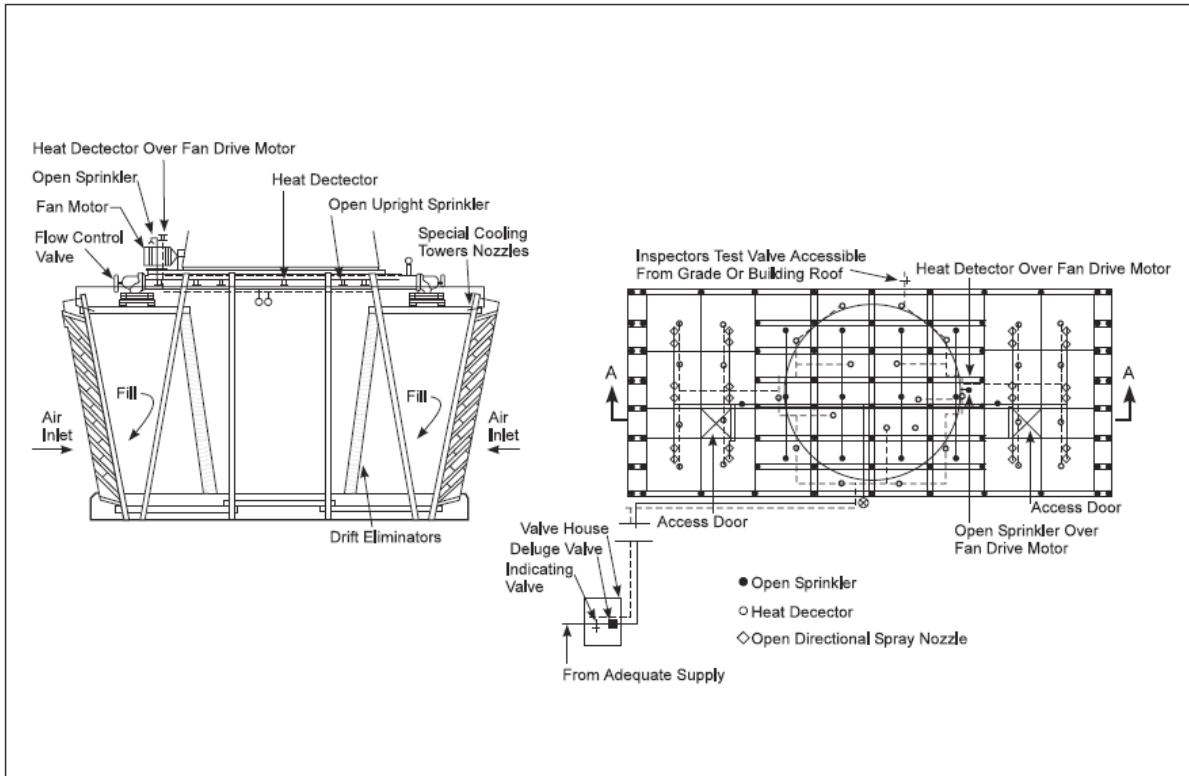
Typical deluge fire protection arrangement for crossflow cooling towers
